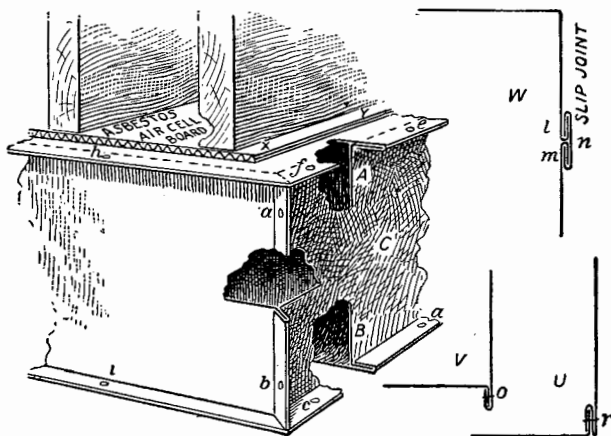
Construction of Sheet Metal Casings, Single Walls, for Indirect Warming
